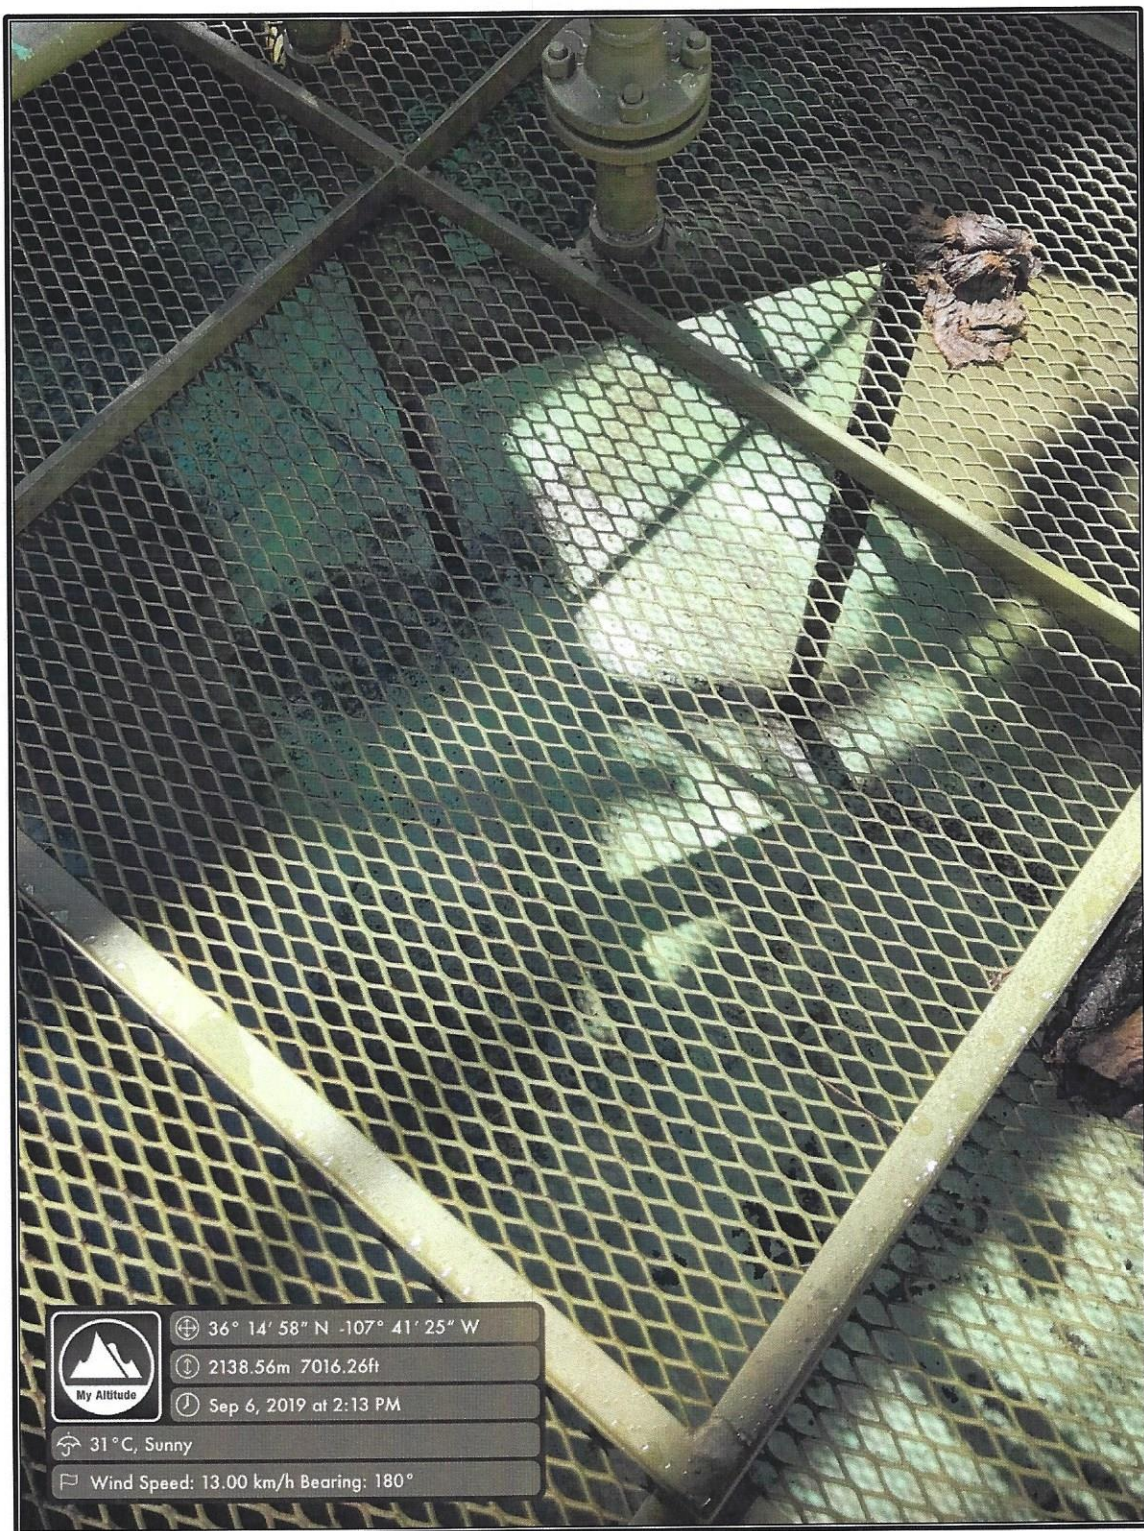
Picture of Pit Tank After Clean-Out (View 1)
